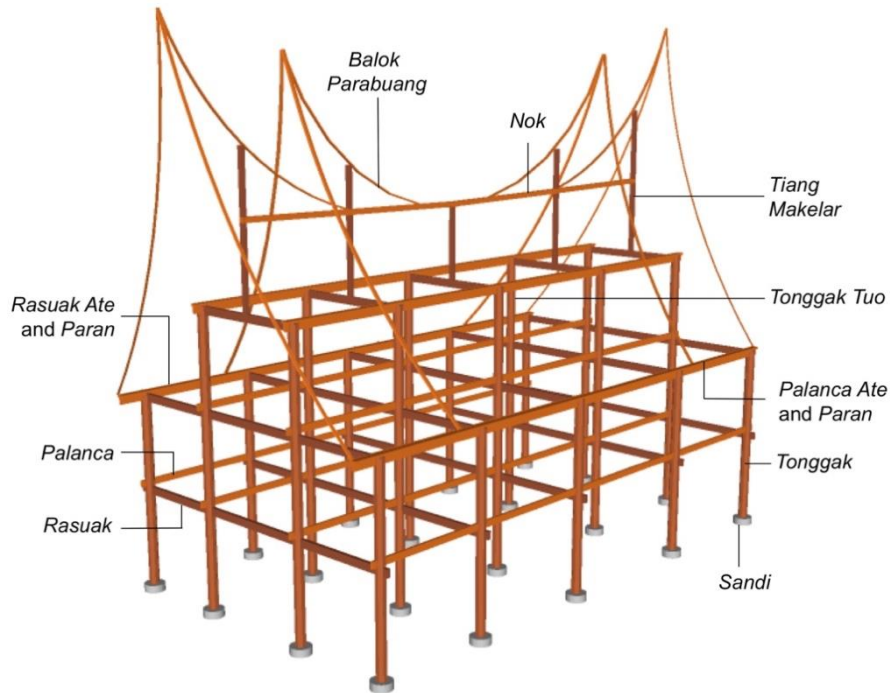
The main structural elements of 'rumah gadang' (Johanita Anggia Rini, 2020)
